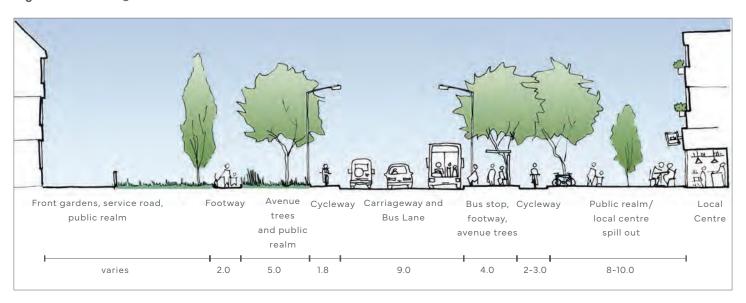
Proposed Oxford Road Section as shown in the Development Brief
